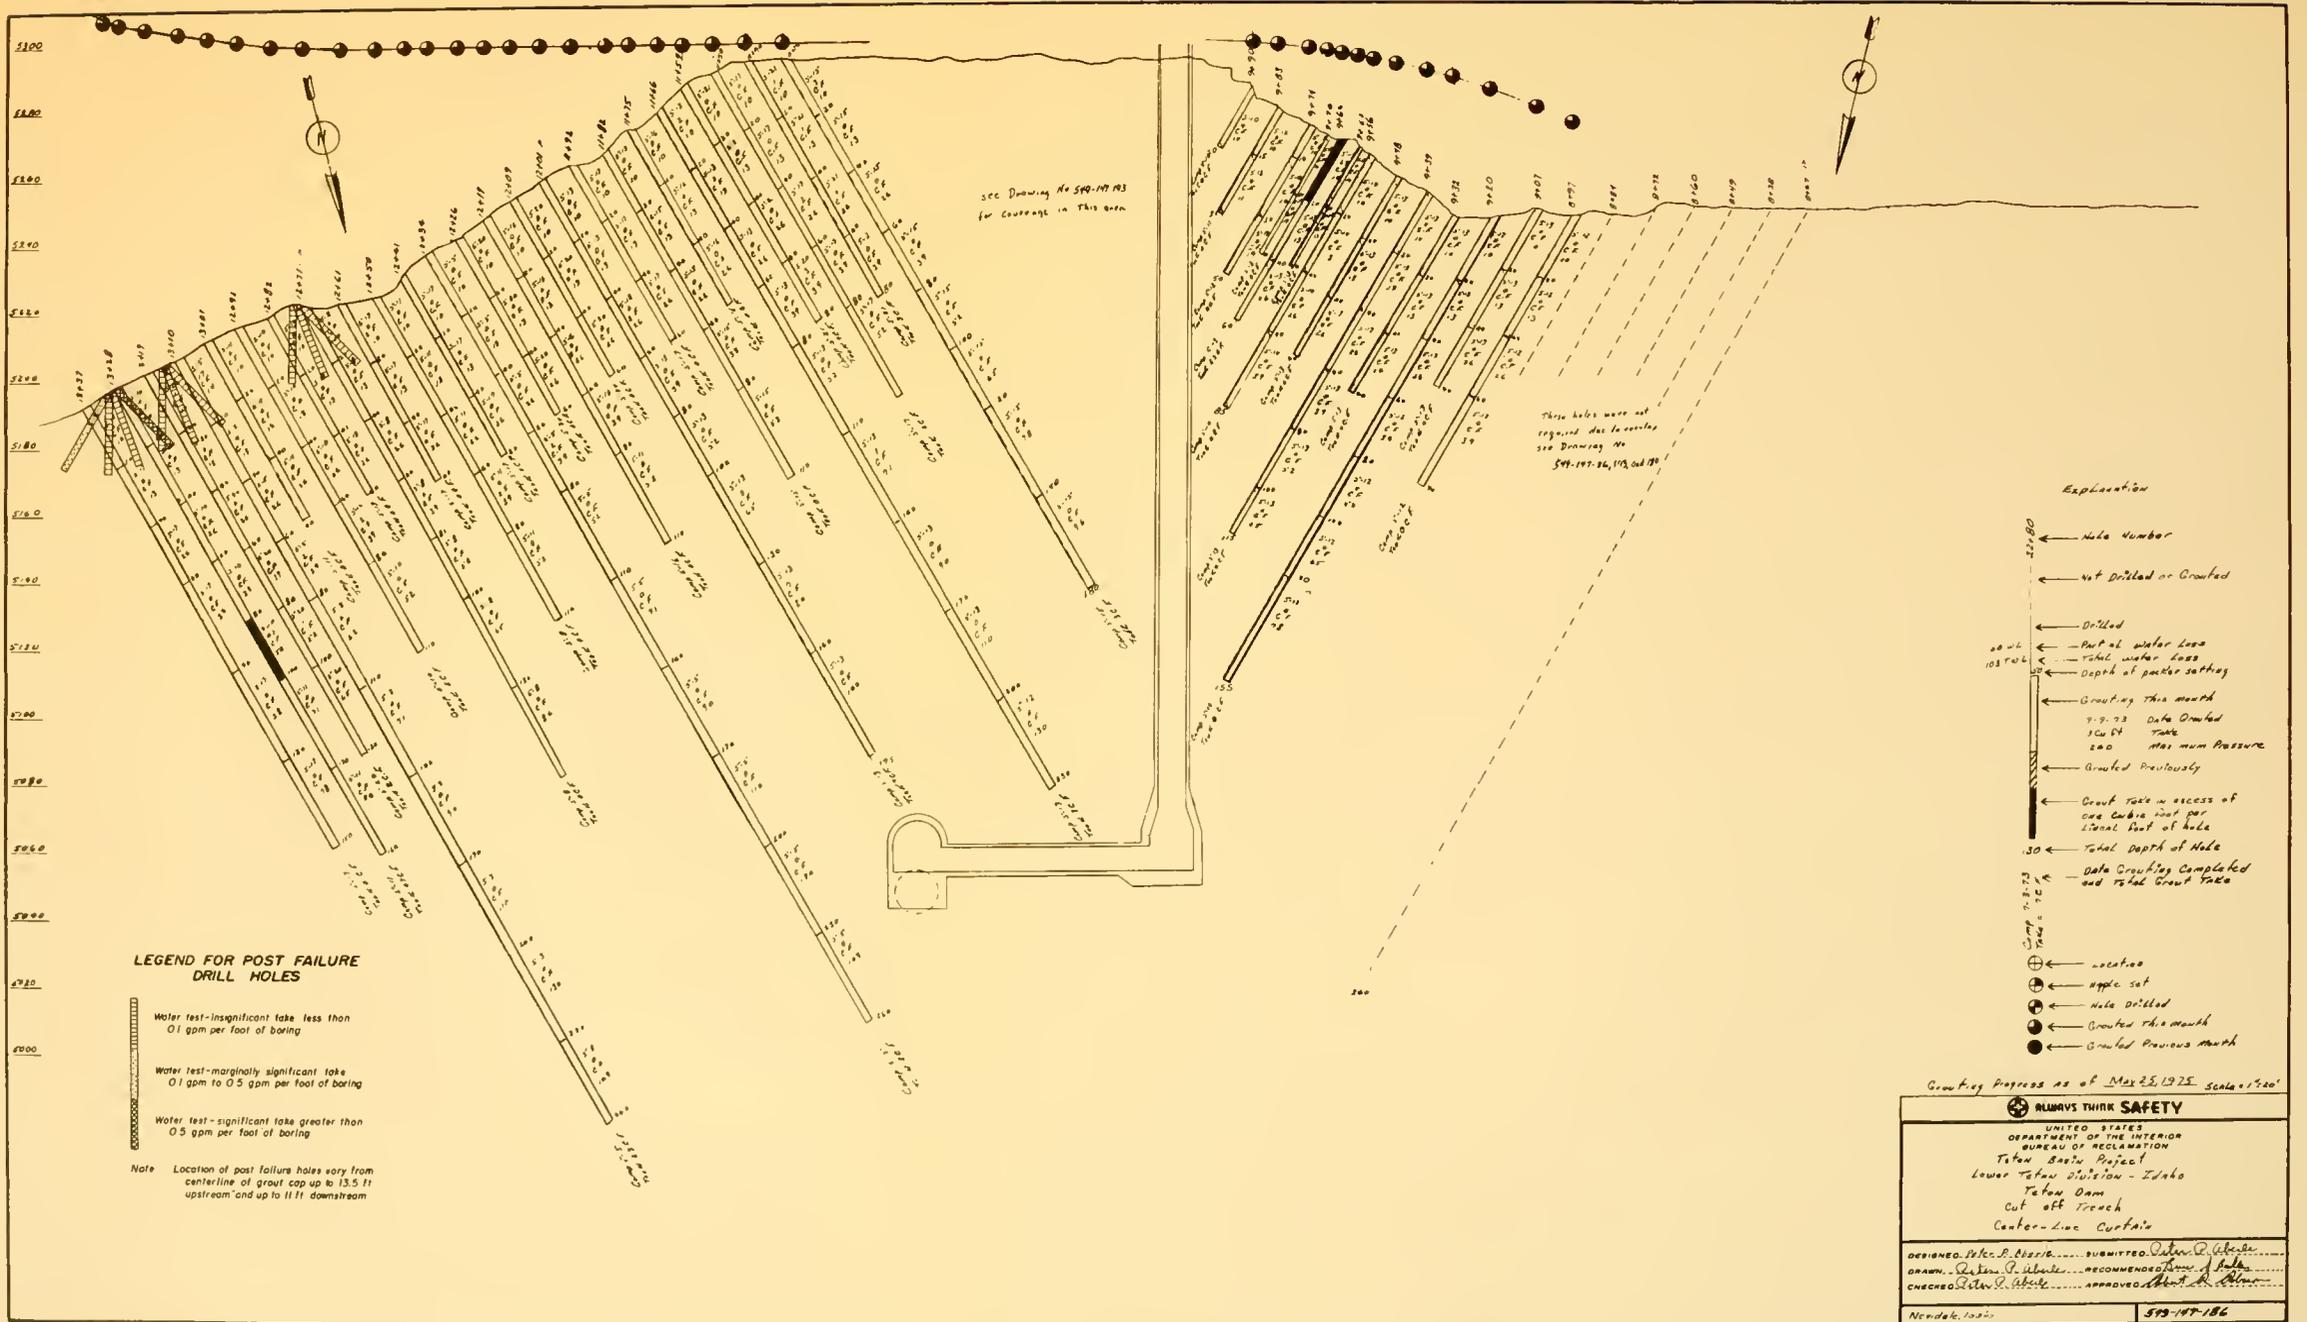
Details of the right abutment centerline grout curtain including postfailure core borings (sheet 1 of 3).
